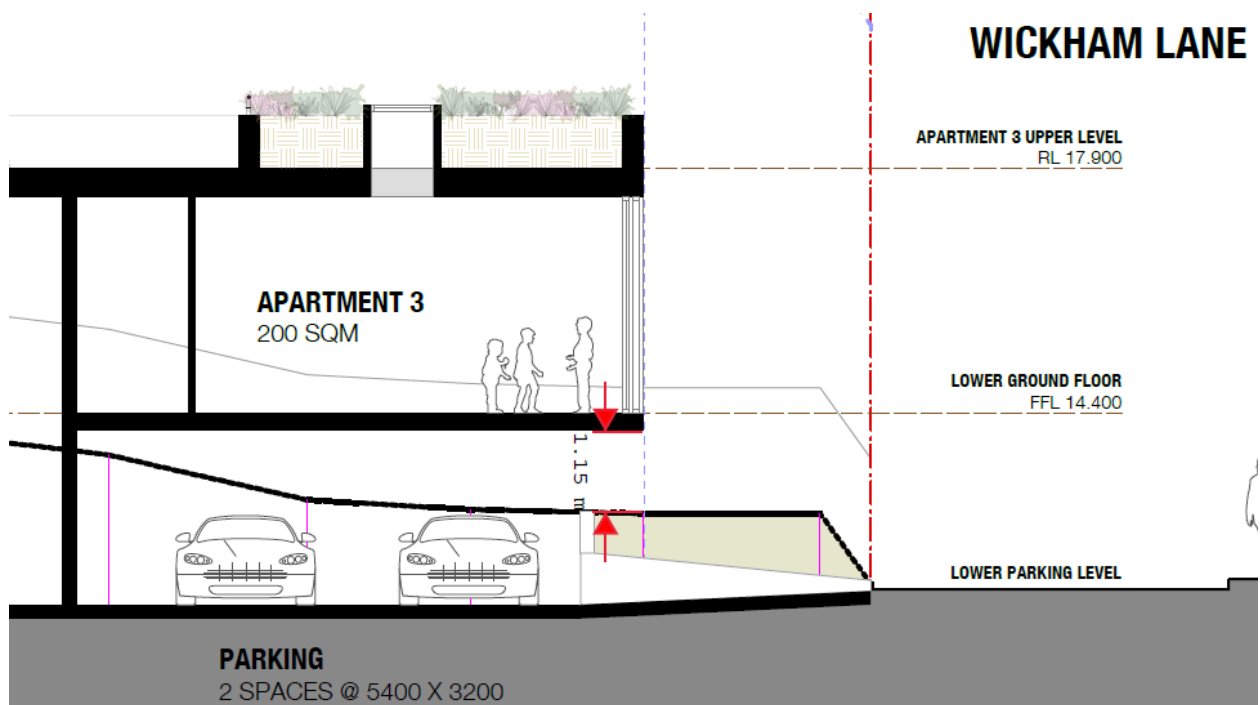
Proposed section through eastern building showing the height of the car parking areas above existing ground level
